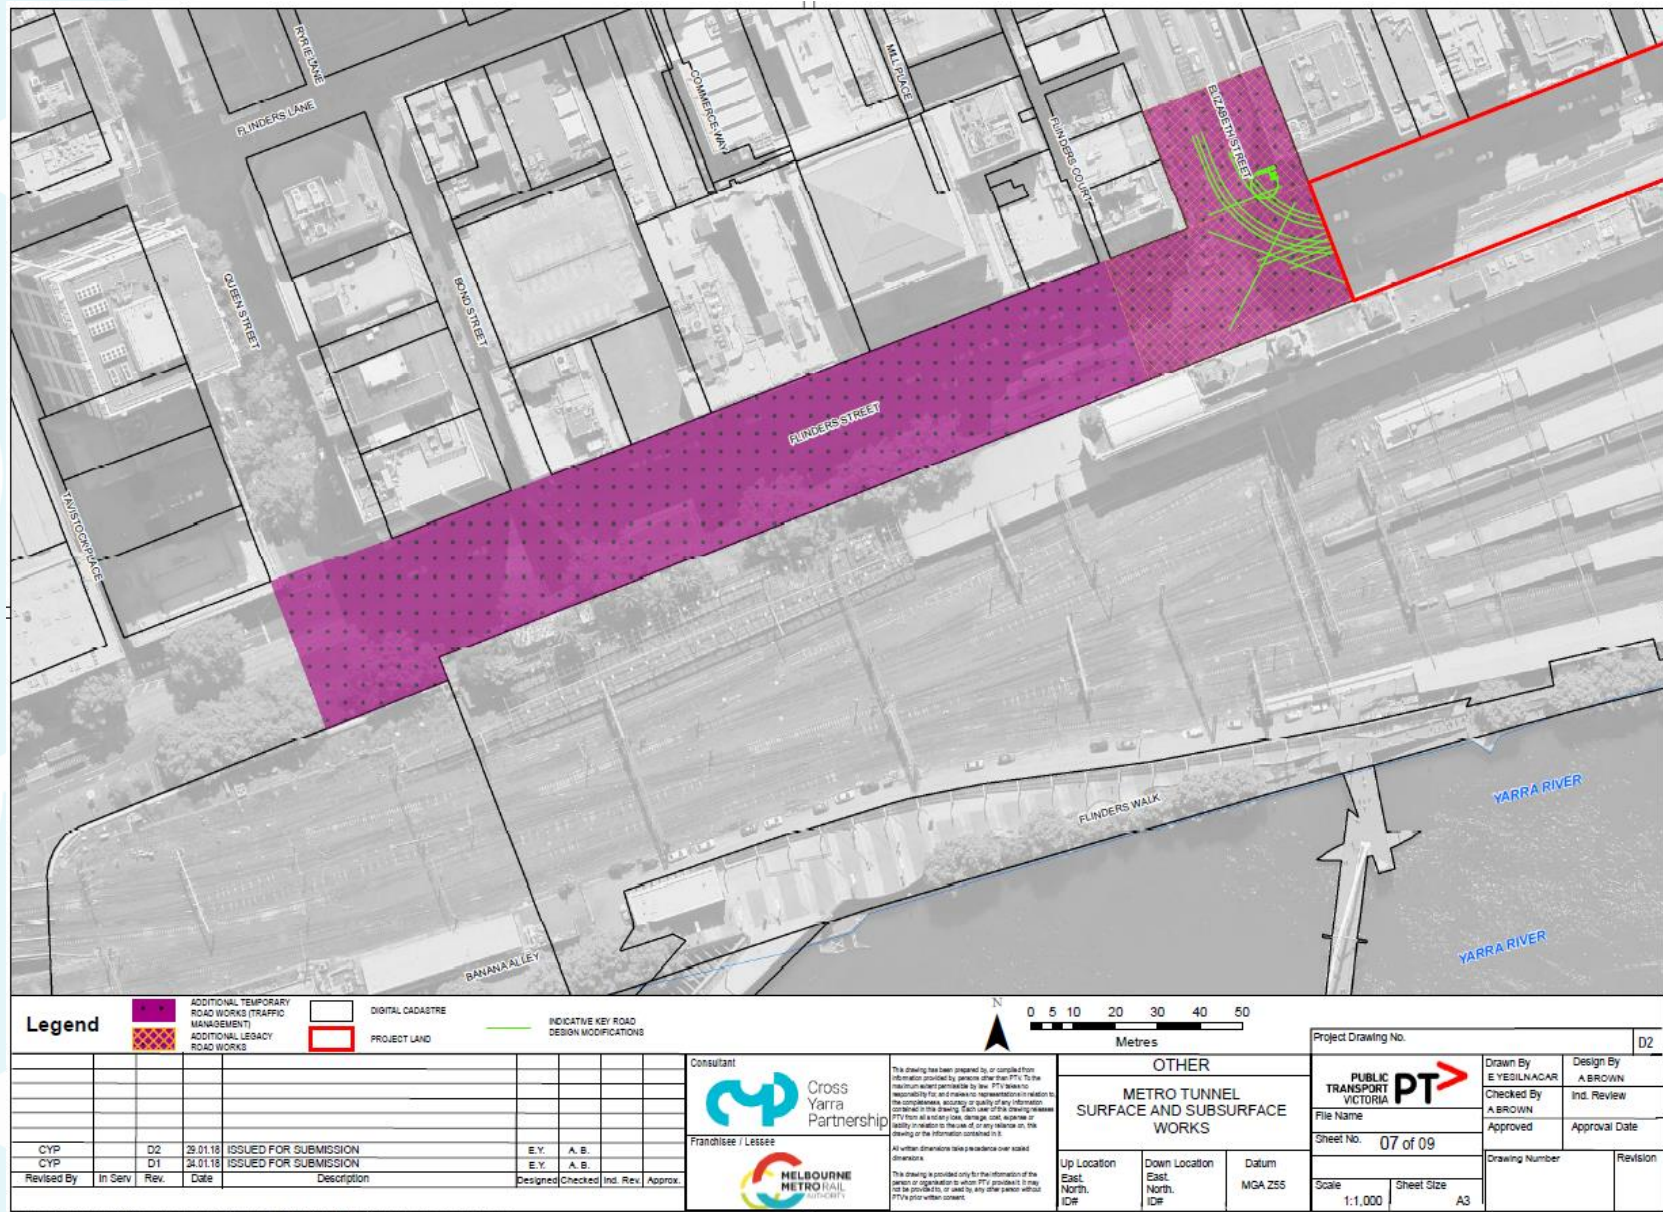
FLINDERS STREET ADDITIONAL ROAD SURFACE WORKS
